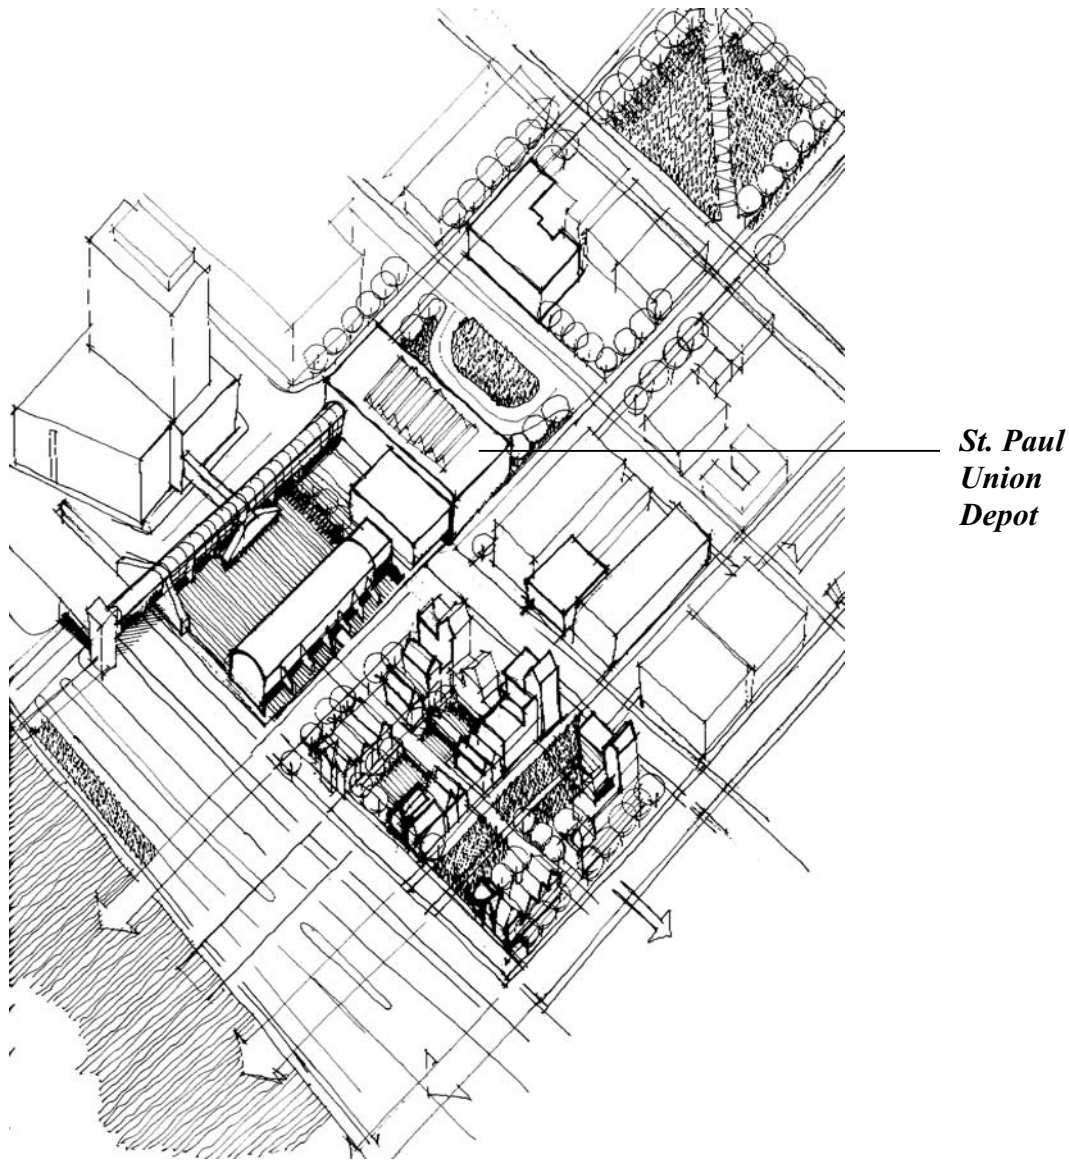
St. Paul Union Depot and Parking Deck Scheme C: New Transit Concourse—Medium Redevelopment, Post Office Acquisition and Relocation
